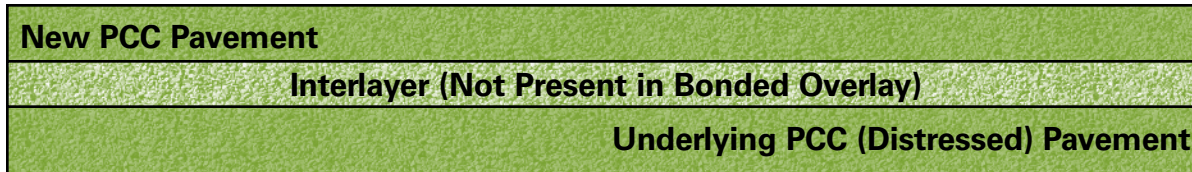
Typical unbonded concrete overlay with bituminous interlayer
